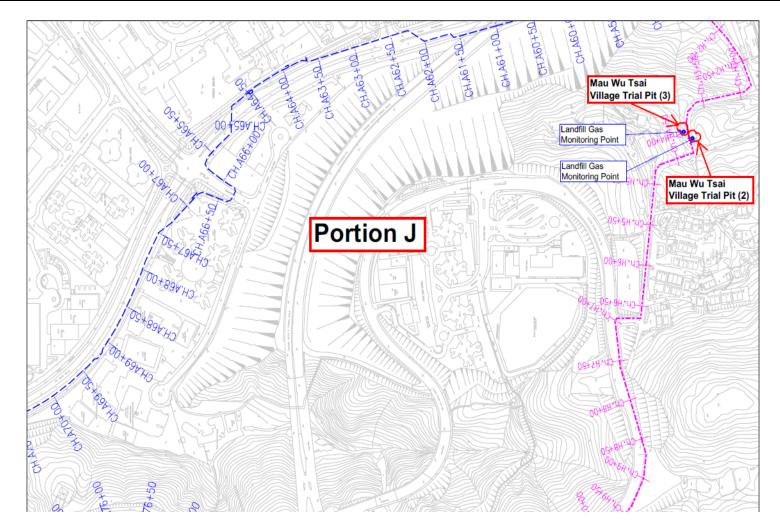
Location Plan for Portion J - Mau Wu Tsai 2 (Po Lam South Road 3)
